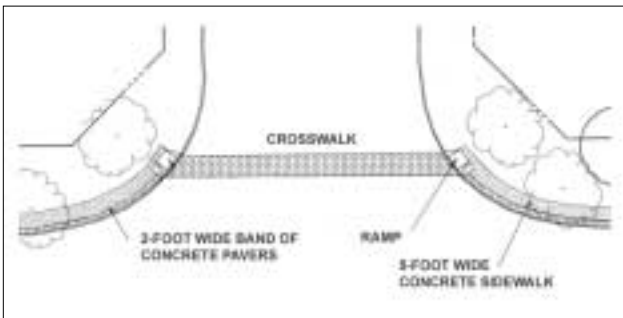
This crosswalk detail shows pavement treatment at an intersection to highlight pedestrian crossings.
